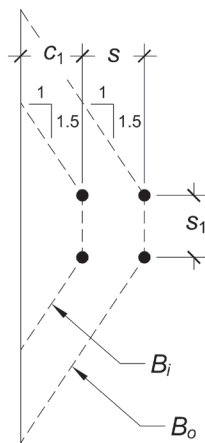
Concrete breakout surfaces for group anchors.
